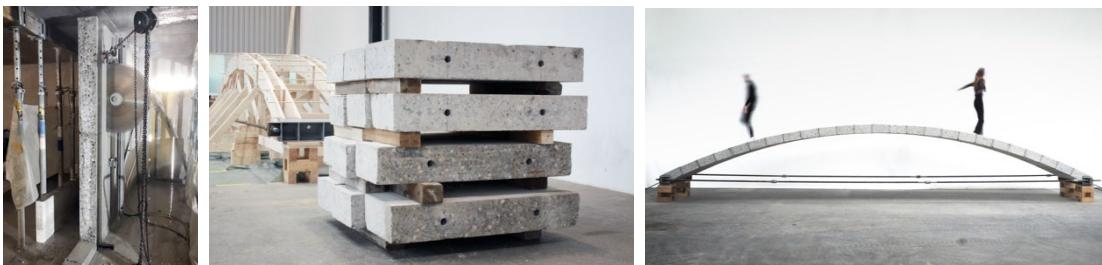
Footbridge built from reused concrete blocks by the Structural Xploration Lab (EPFL)
